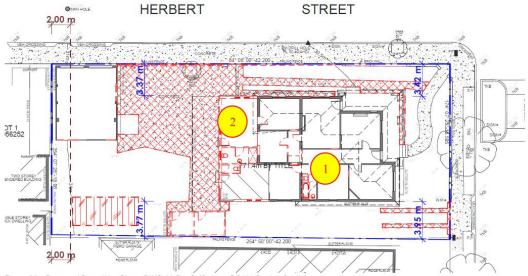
Proposed Demolition Plan - DWG 03 Rev B (Source: DS407 Design Studio)
